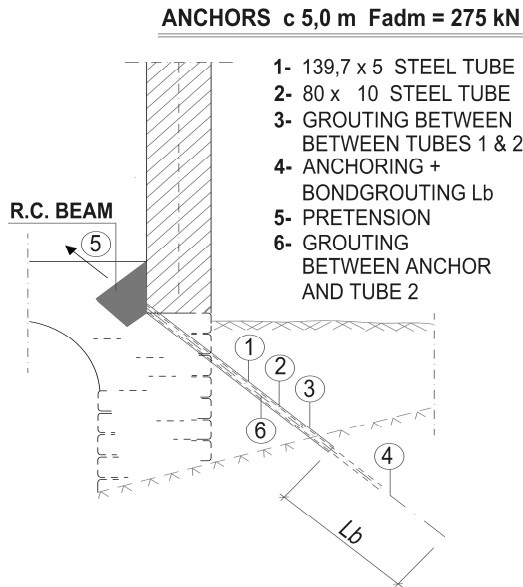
South wall. Rock and earth anchors Photograph 4: Reinforcement of concrete arch
